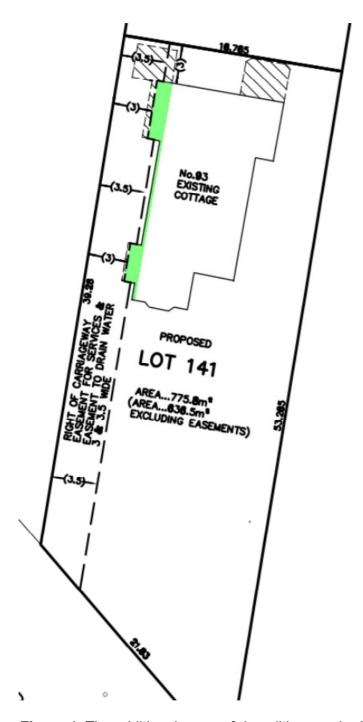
The additional areas of demolition required to provide compliant widths for the driveway (right of carriageway) shown in green.
